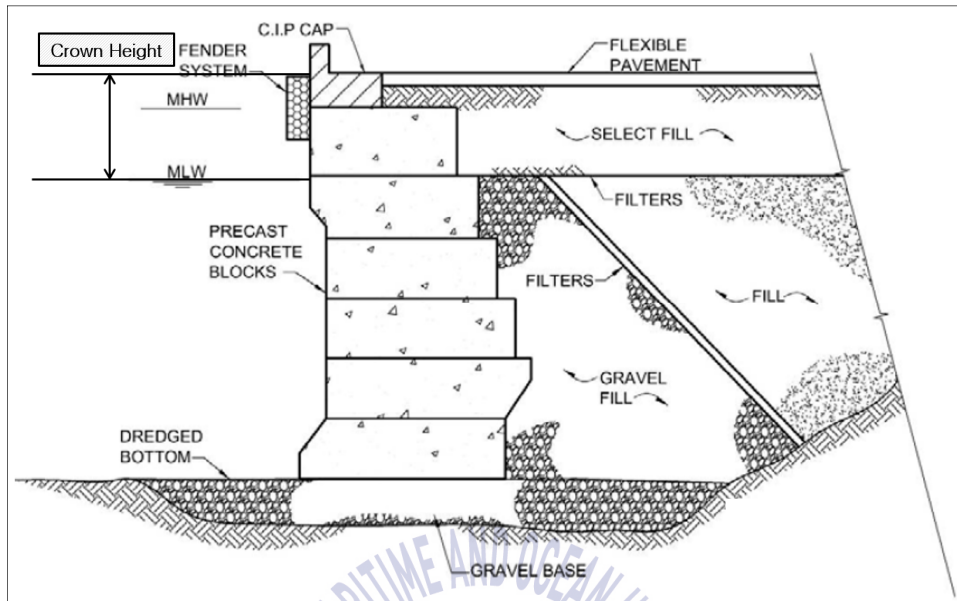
Key elements of solid type and concrete block construction(U.S.A)
